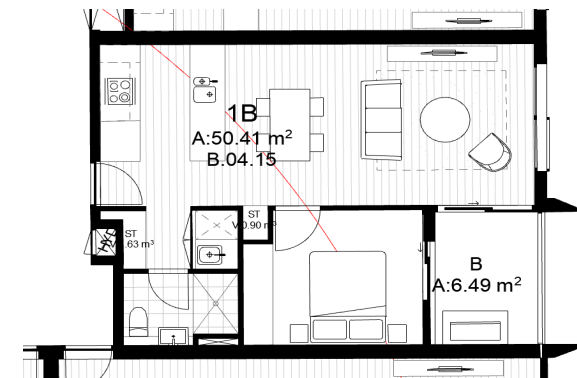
E1.2 Various 1 Bedroom apartment balcony in BLD B
